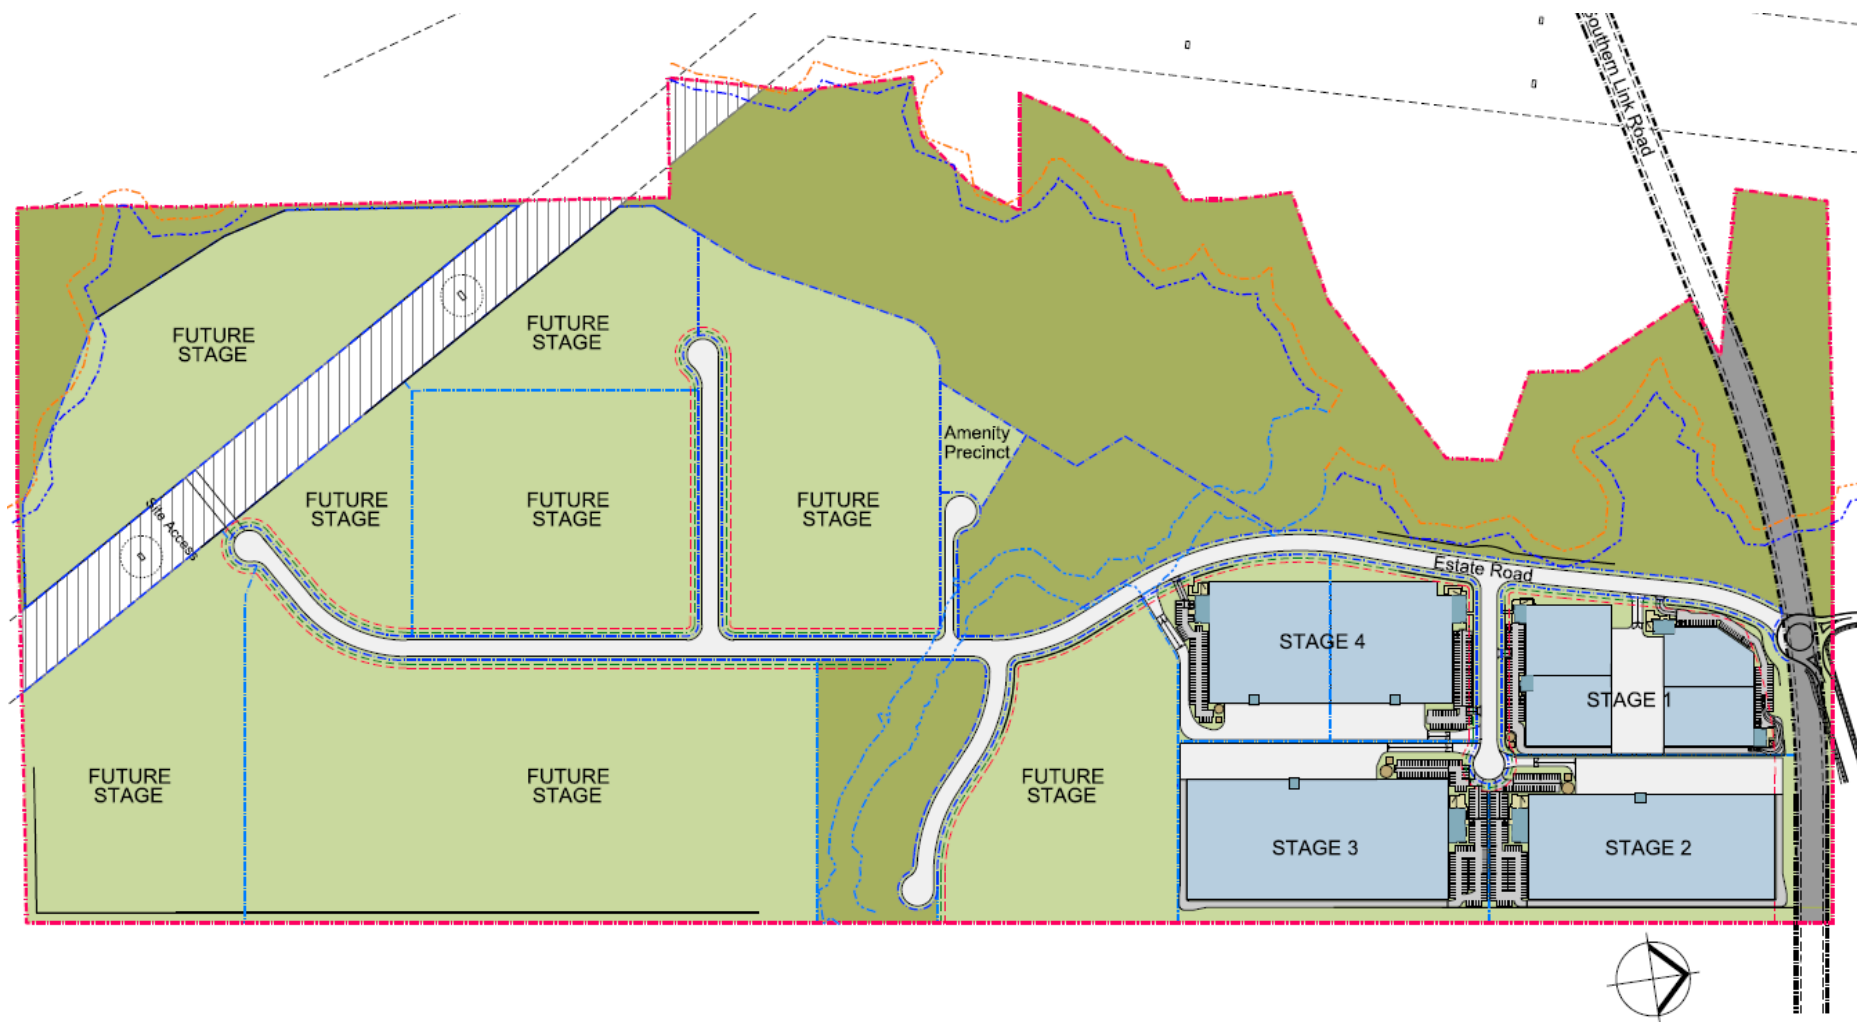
Building Staging Plan – Oakdale Industrial Estate – South
